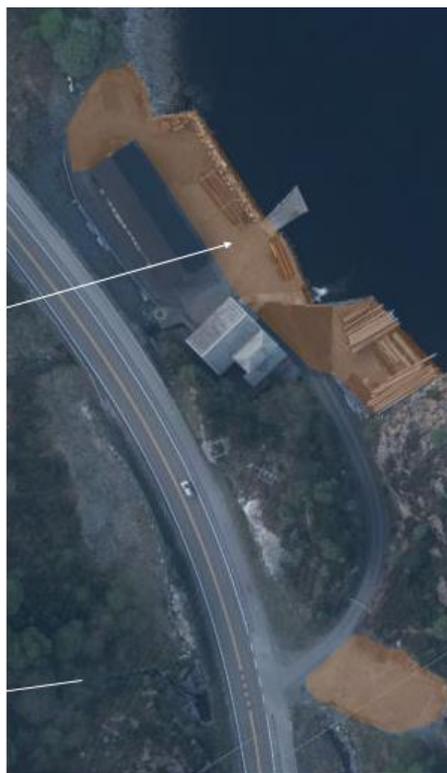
Proposed installation location facilities at the Jektevik in the southwest location
